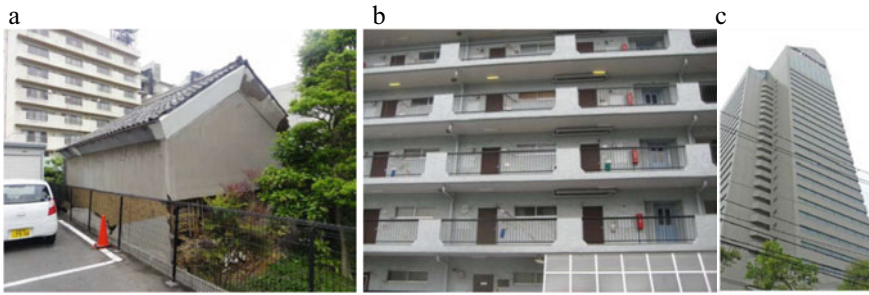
Performance of buildings in Sendai. a Damage to wooden house, b diagonal shear cracks at RC building wall [10], c no visible damage to Lion Tower Kotodai [20]
